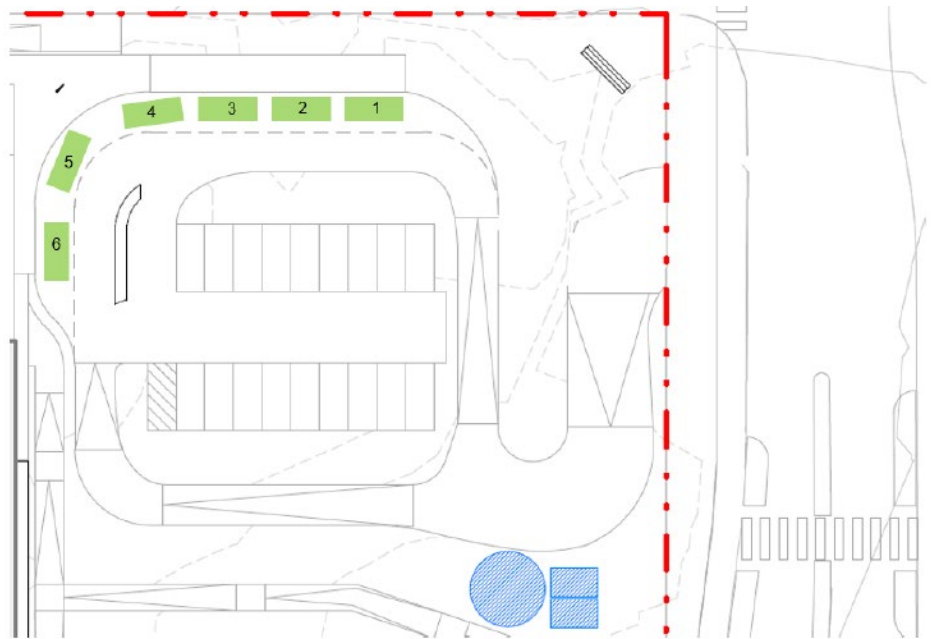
Layout of Pick up / Drop off Area proposed via Nullum Street.
